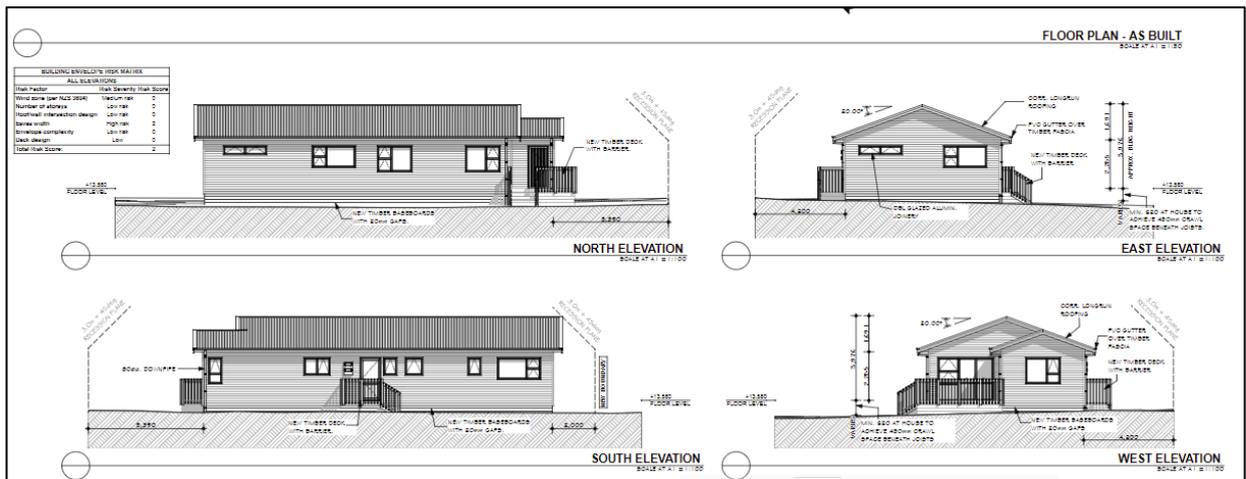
Proposed Elevation Plans (3-bedroom dwelling)
